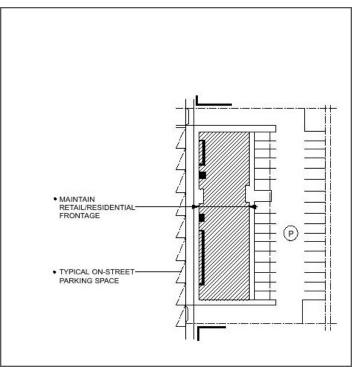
Site plan for intermediate infill site with surface parking lot partially beneath building. (See also photos, Figures 7.3 and 7.4.)
